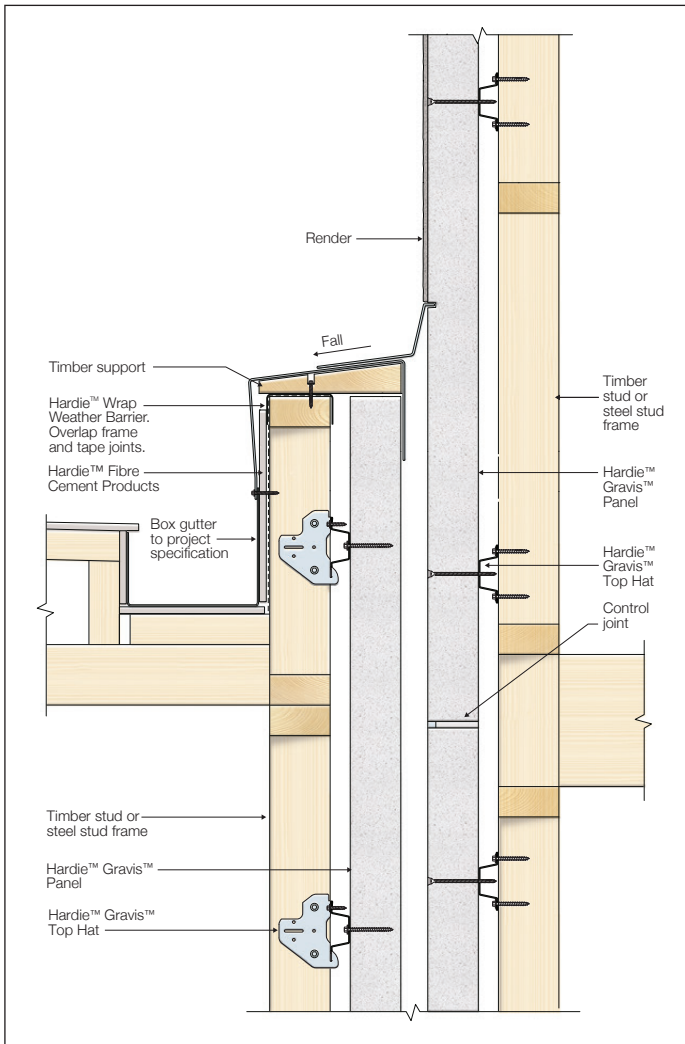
ZERO LOT WALL TO EXTERNAL WALL DETAIL
